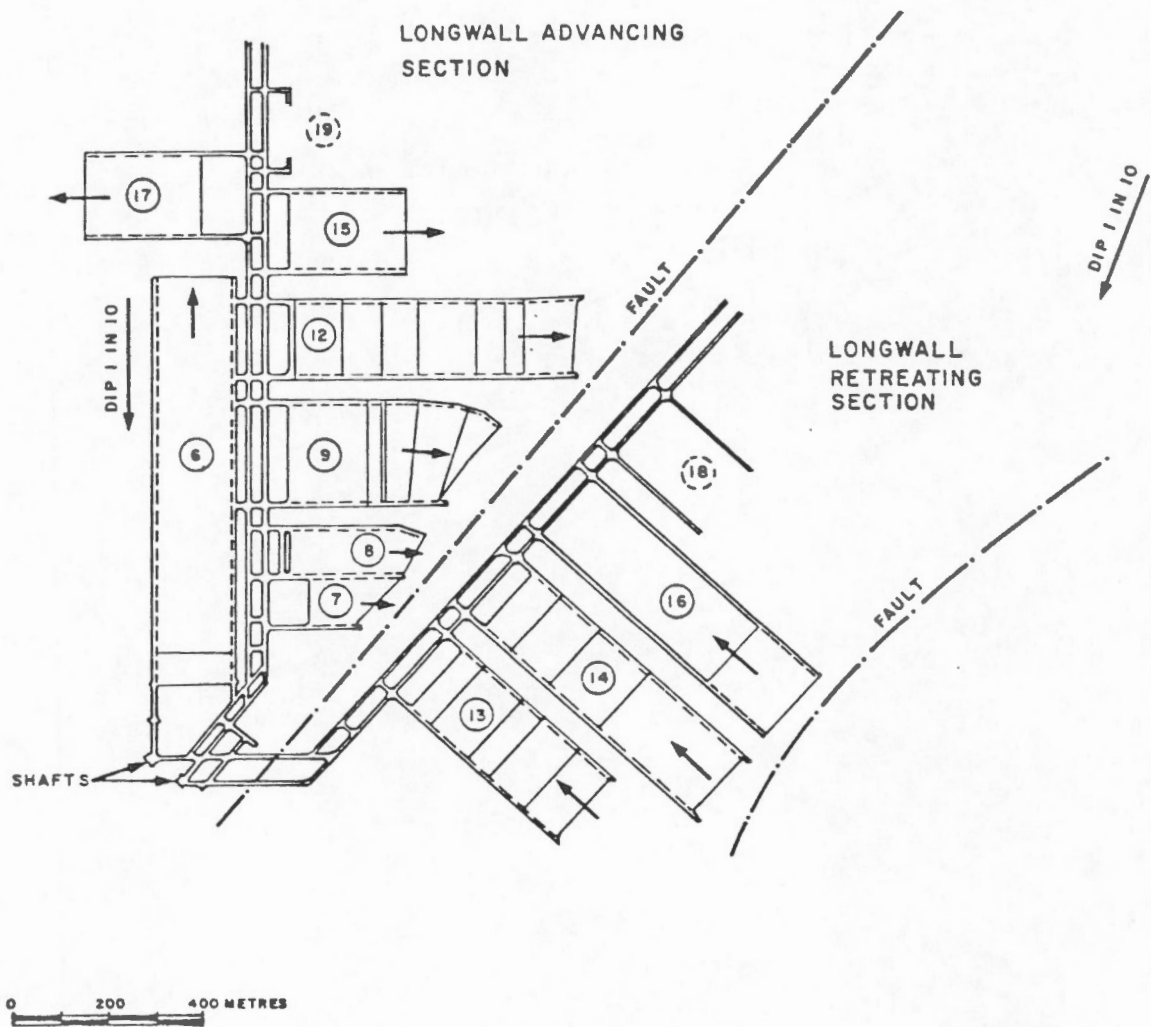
UNDERGROUND MINE SHOWING TYPICAL LONGWALL ADVANCING AND RETREATING SYSTEMS
